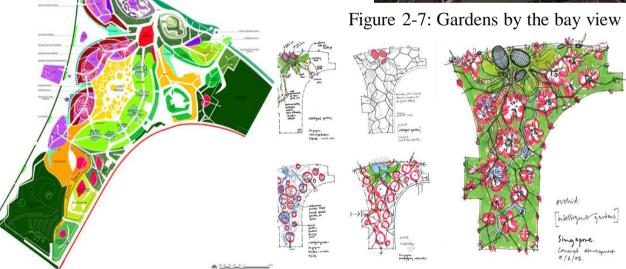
Gardens by the bay Site plan Figure 2-9: Gardens by the bay concept
